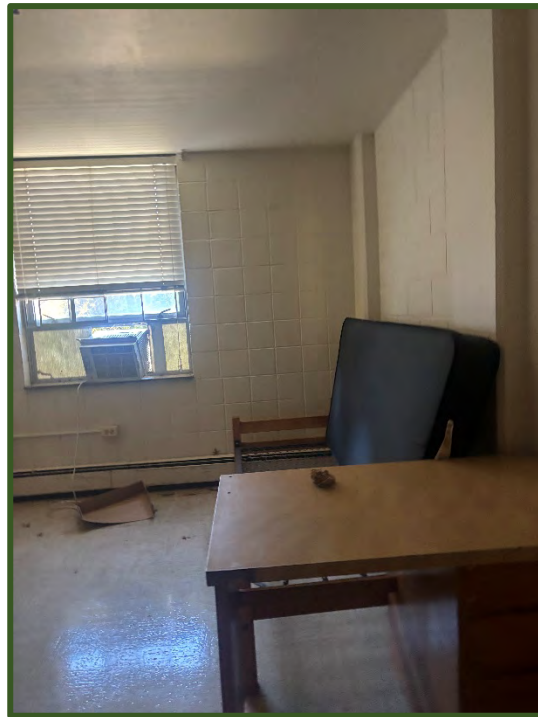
Lack of central air conditioning in Dayton Hall, with built-in wall unit.
